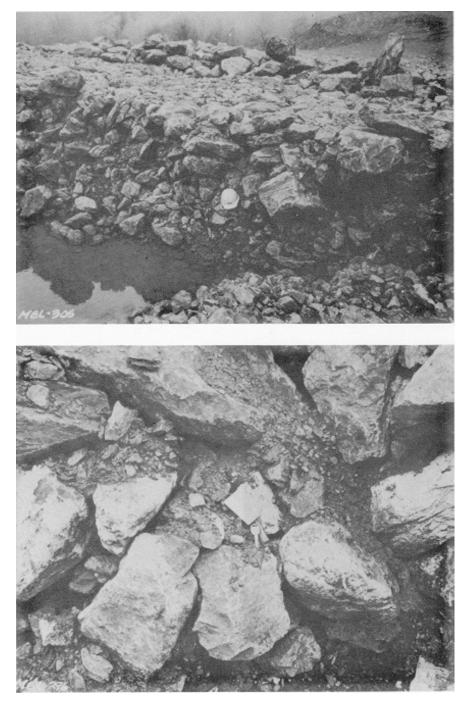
Photographs of sound rockfill, New Melones Dam test fill inspection trench
